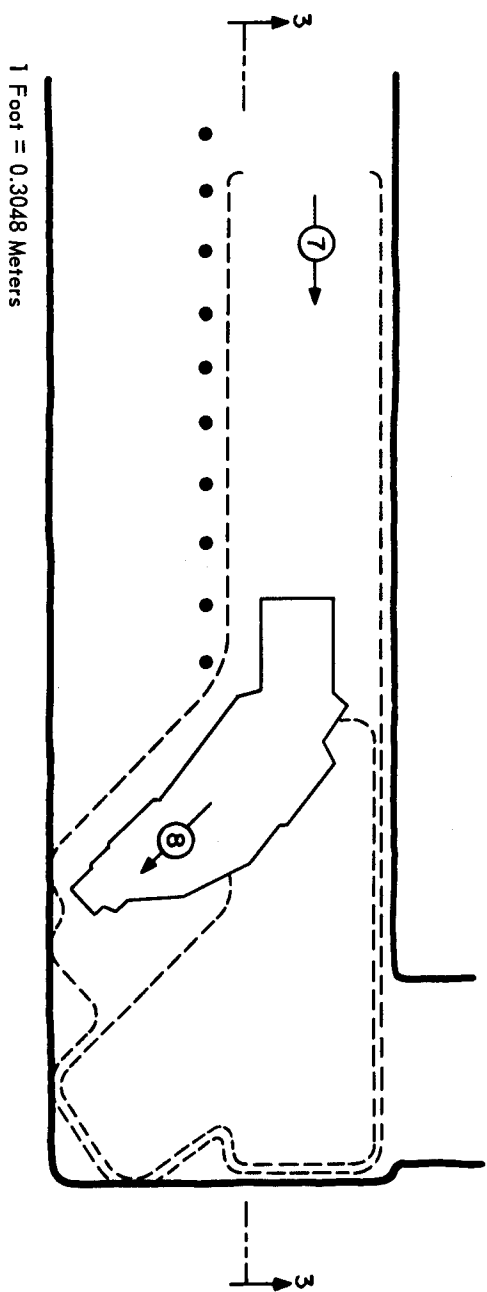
FINAL PHASE OF FLOOR COAL EXTRACTION, BALMER NORTH MINE
